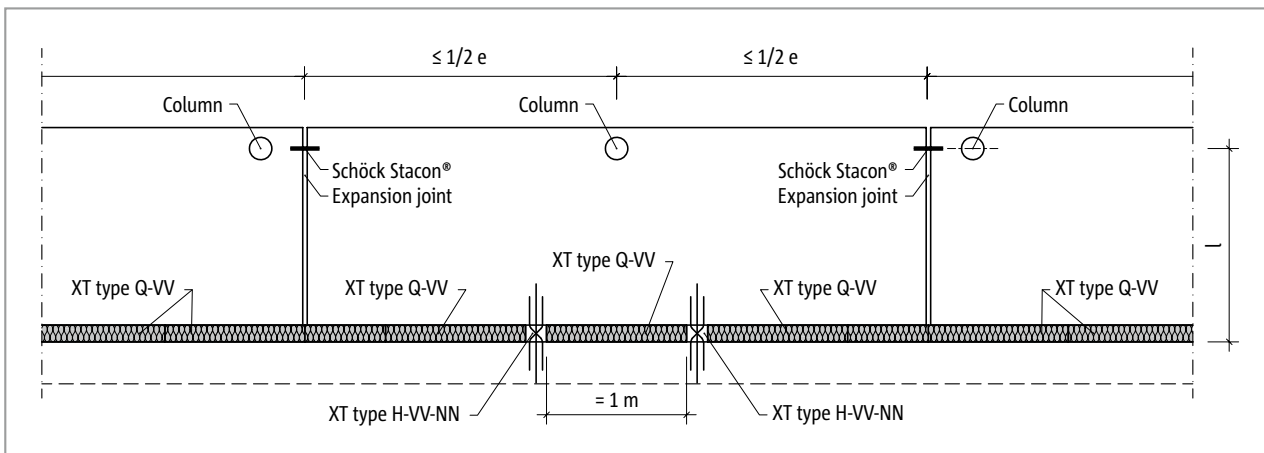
Schöck Isokorb® XT type H: Expansion joint arrangement
